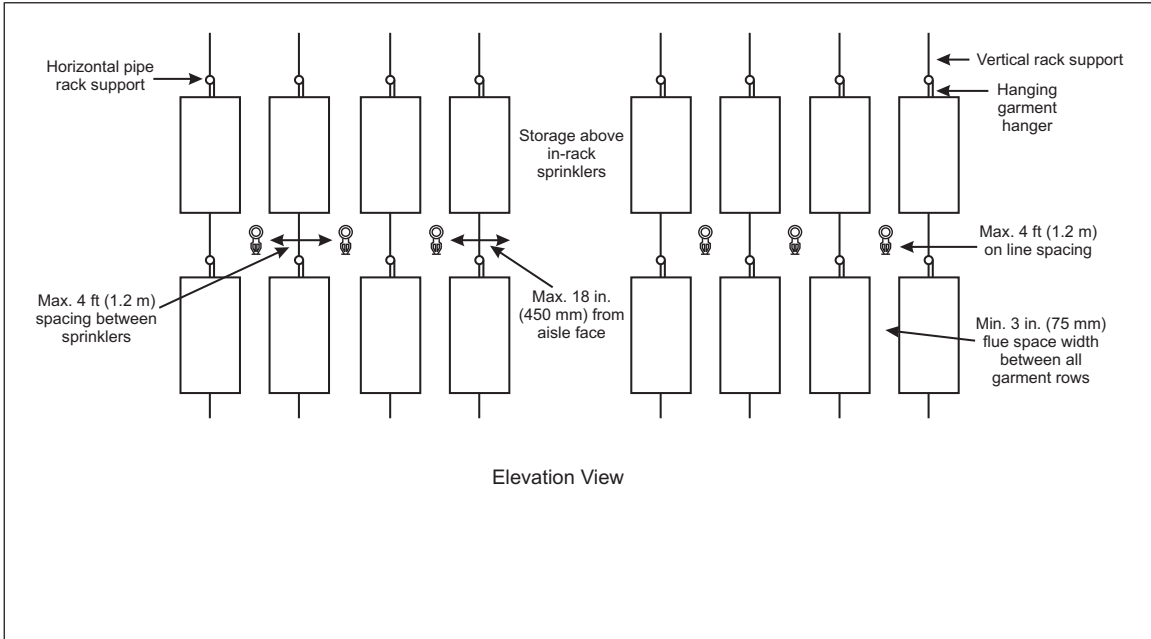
Horizontal location of in-rack sprinklers for storage over 2 hanging garment rows wide
